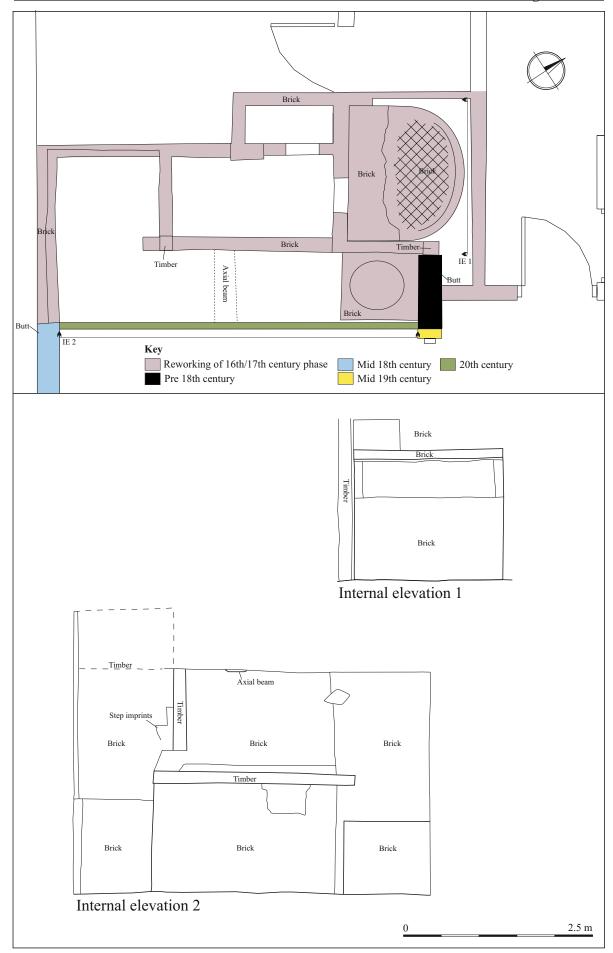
Detail plan and internal elevations of chimneystack, west end of structure A 11
